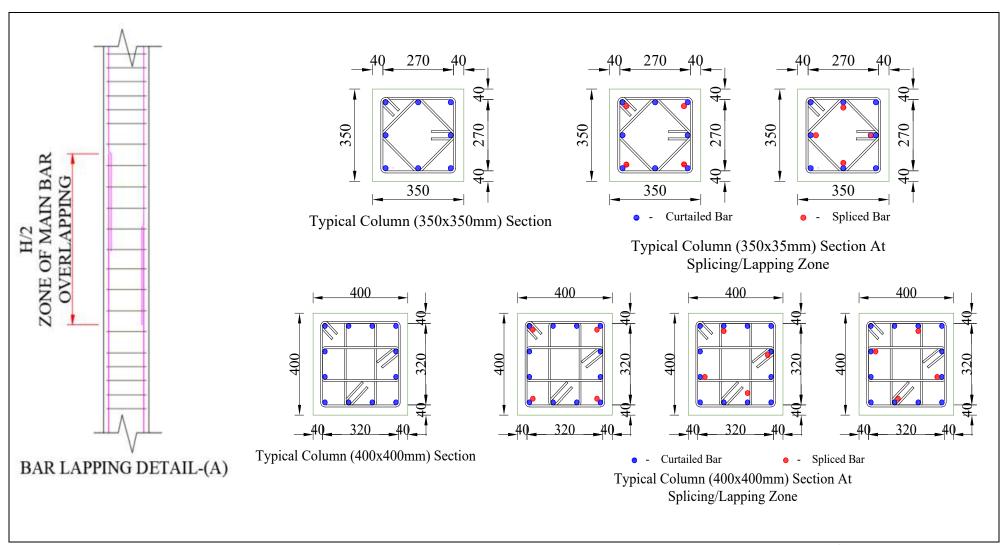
TYPICAL COLUMN DETAIL FOR THREE STOREY BUILDING
